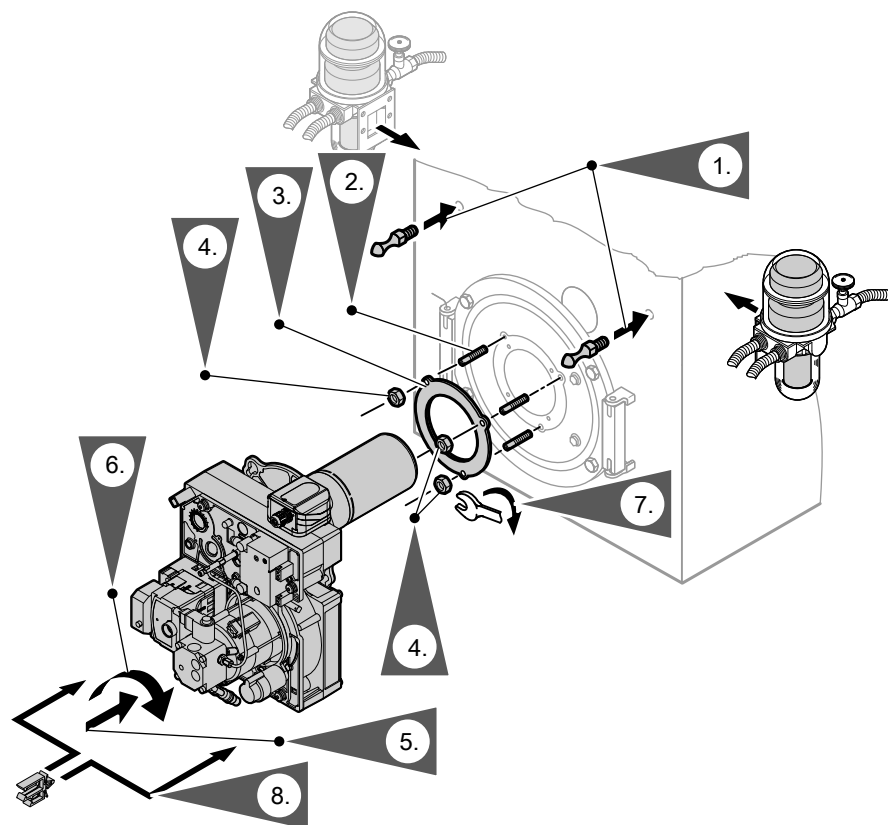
18 to 27 kW burner, view with Vitoladens 300-T
